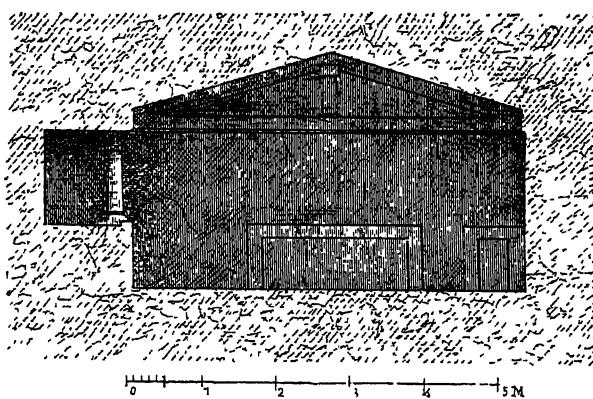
The Broken Tomb. Transverse section through end wall of vault.
